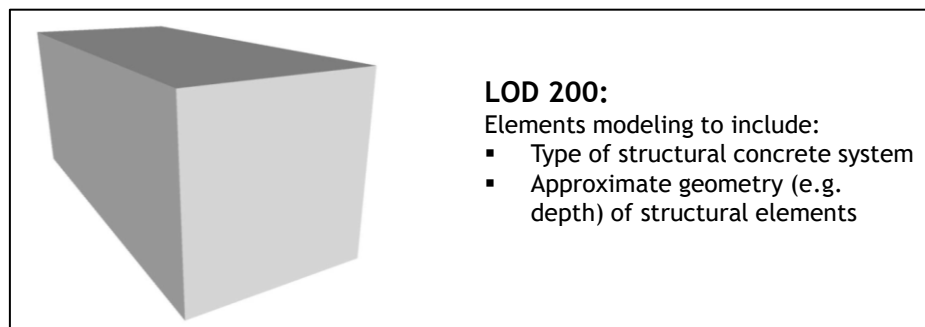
Highway Bridges Precast Structural I Girder (Concrete) (BIMForum, 2016).
